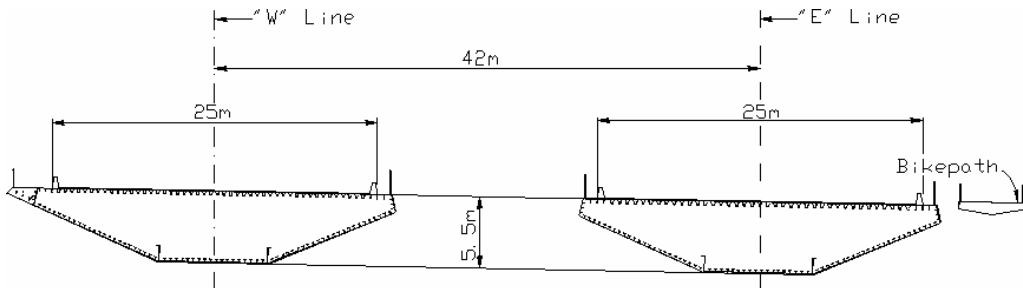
Typical Cross Section of Bridge – Dual Box Girders with Cross Beam
